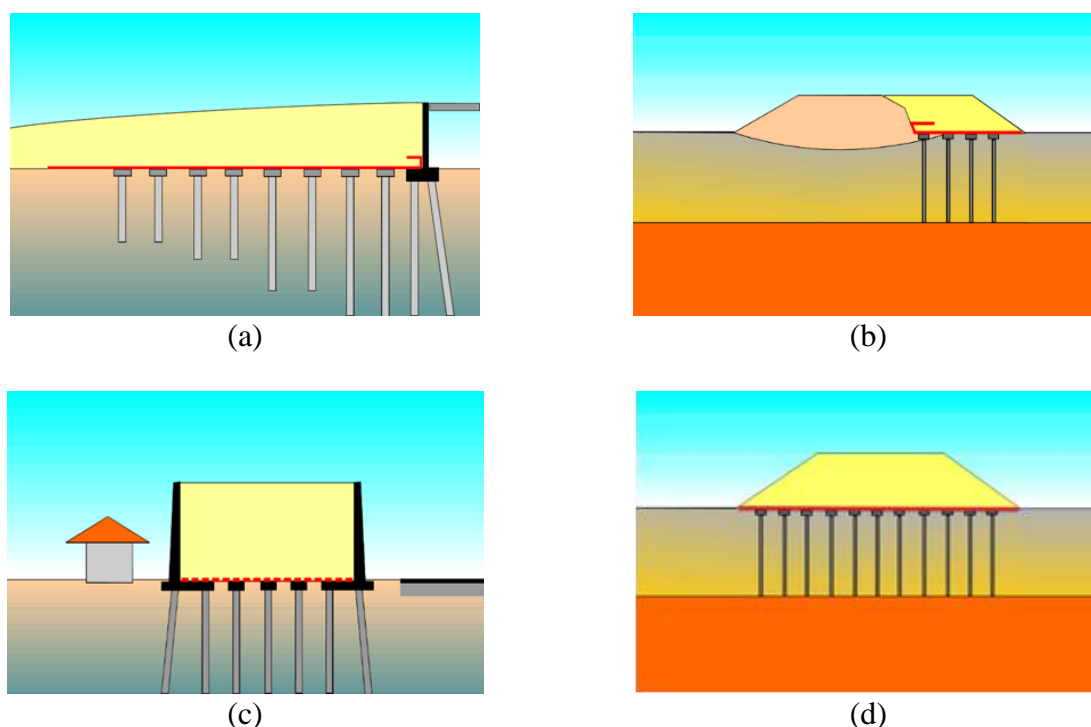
Examples of column supported structures: a) bridge ramp and abutment, b) roadway widening, c) storage tank and d) embankment stabilization
